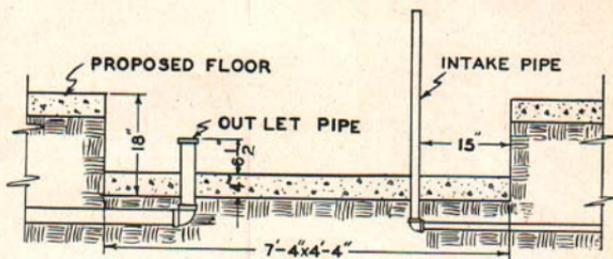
Step No. 1 shows the excavation for the tank with the concrete sub-floor in place.
